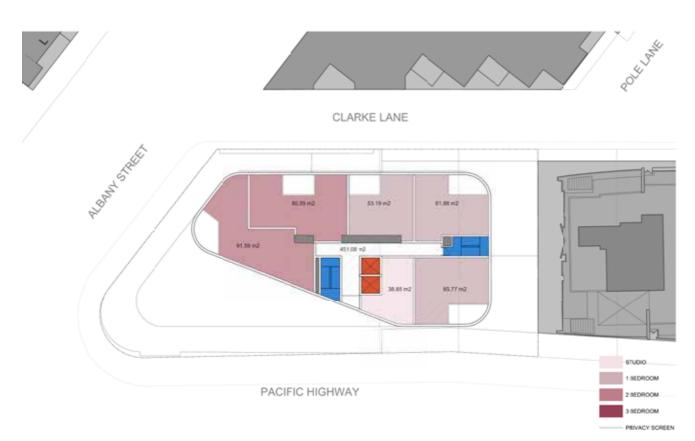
Indicative Floor Plan - Levels 7-16 typical  $A_{\text{J+C}}$
